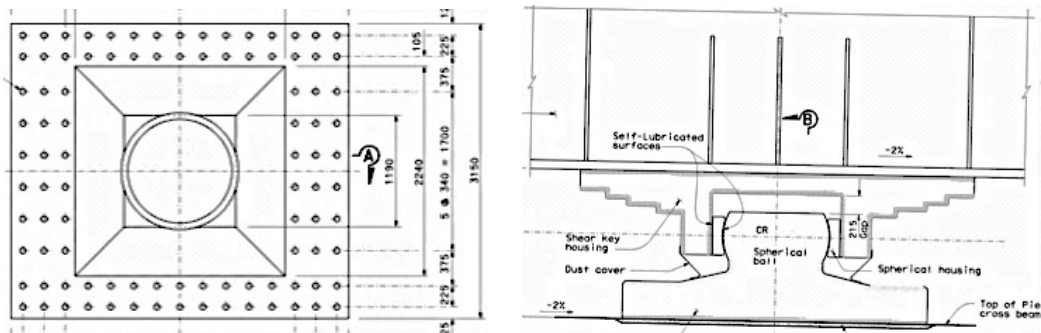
Plan and lateral view of shear key at Pier E2 [Ref.: Caltrans drawings 888/1204].
